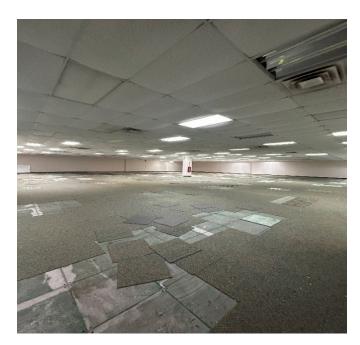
(Left) – Open concept floor plan of the old Data Center.
